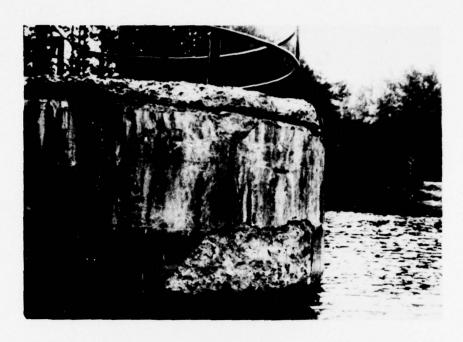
SPALLING AND SCALING OF THE INTAKE STRUCTURE
